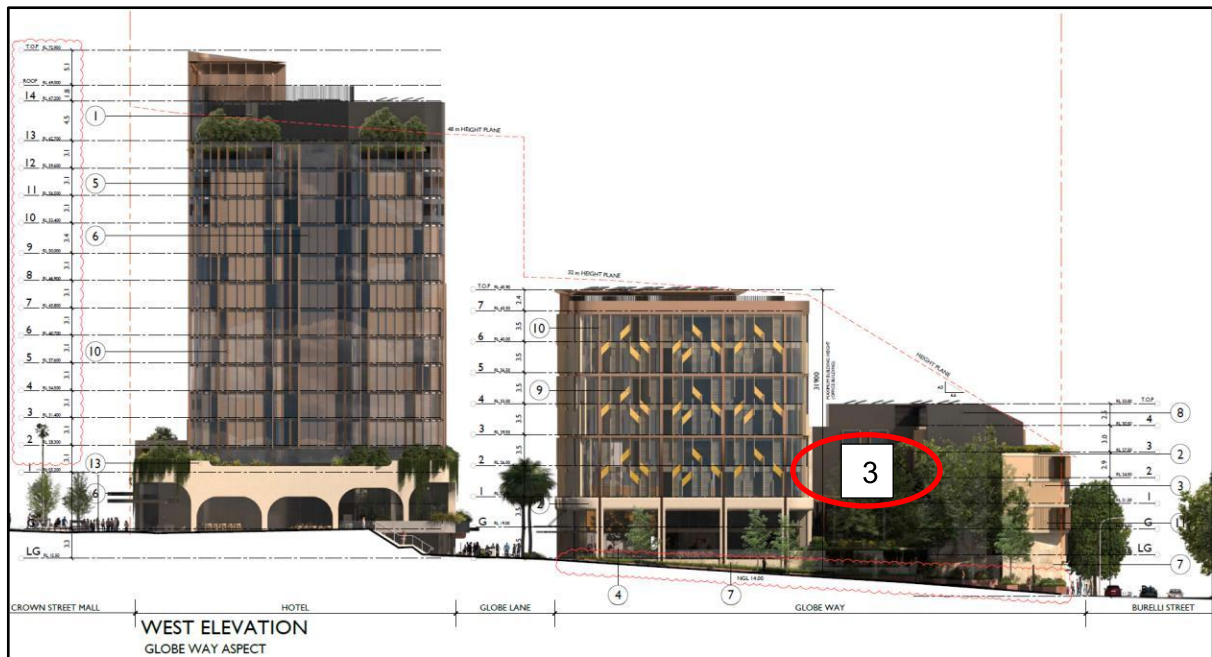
WEST ELEVATION EXTRACT (ADM/JT)
